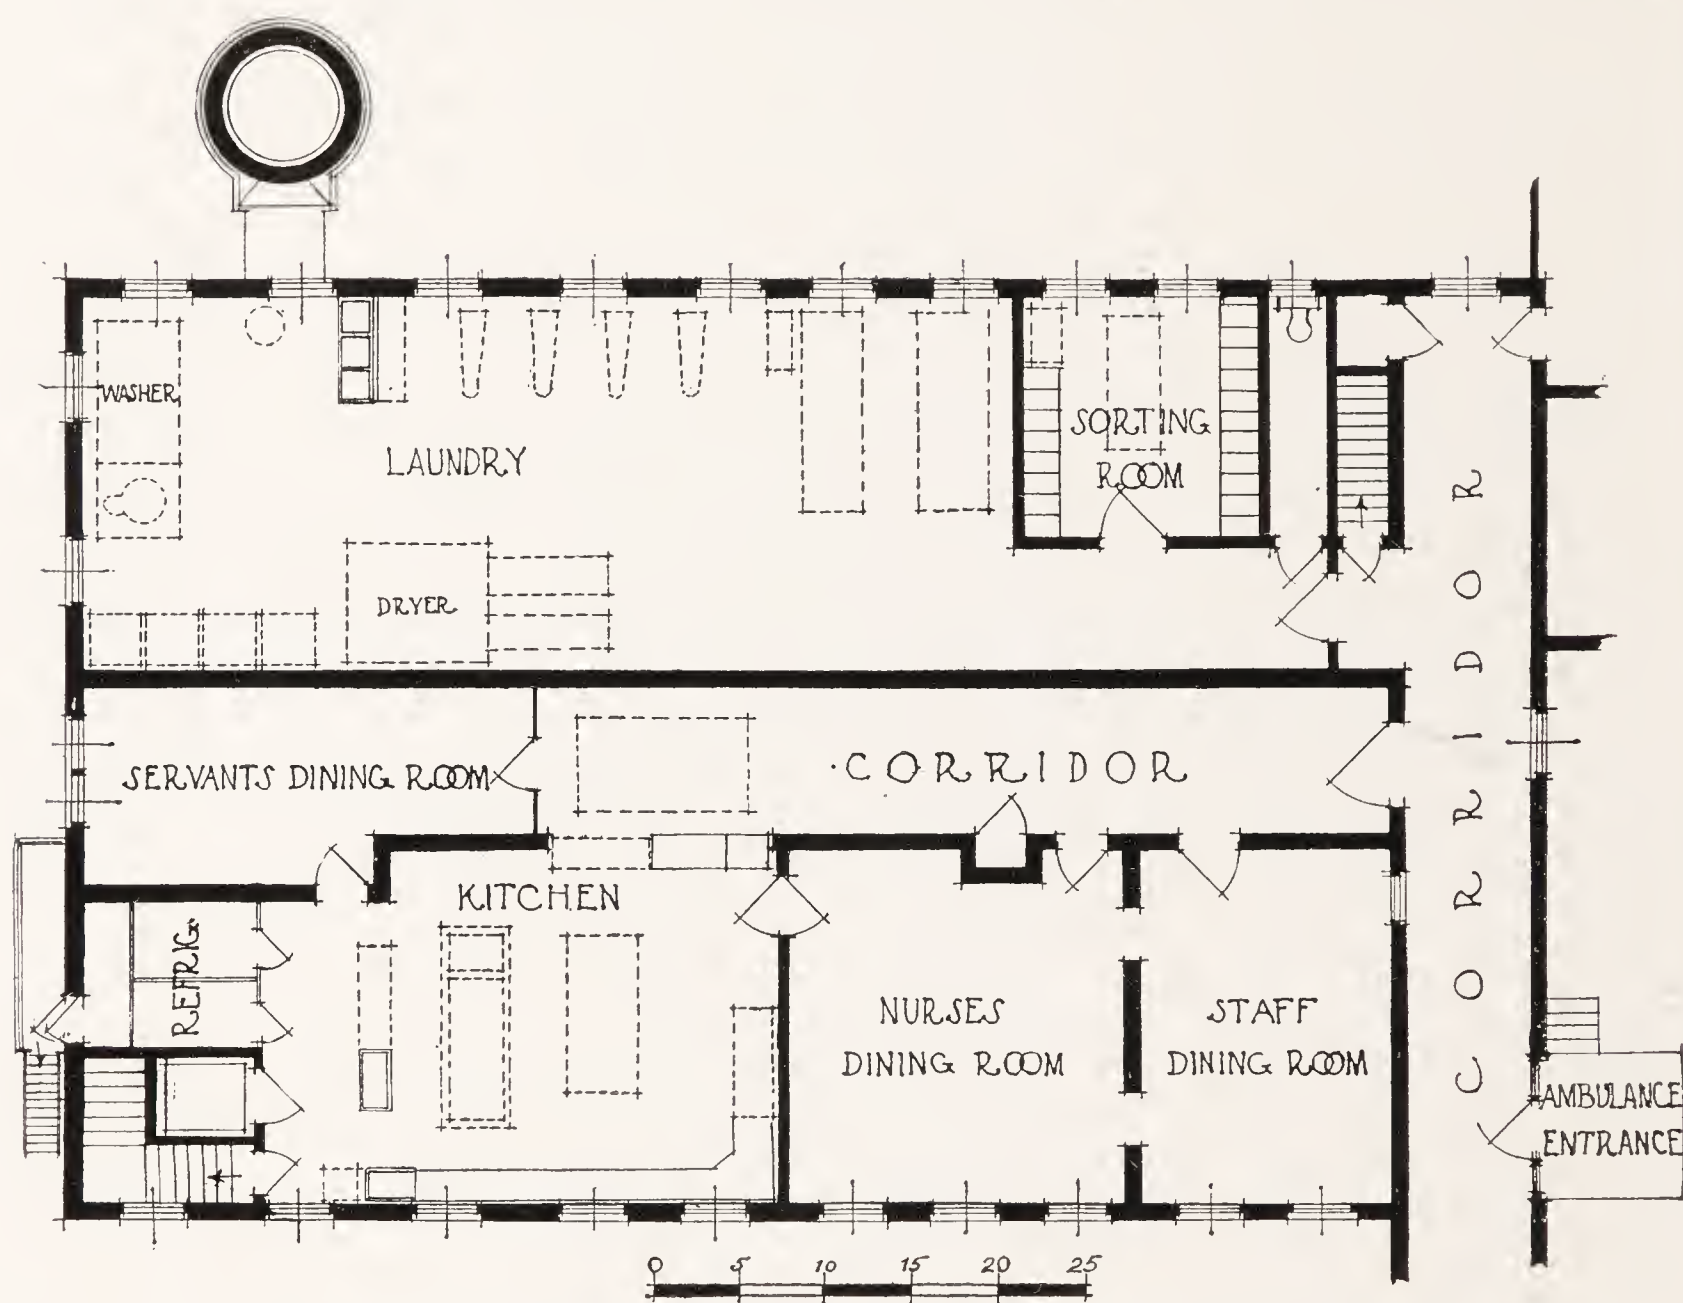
SERVICE BUILDING, NEW ROCHELLE HOSPITAL, NEW ROCHELLE, N. Y.
